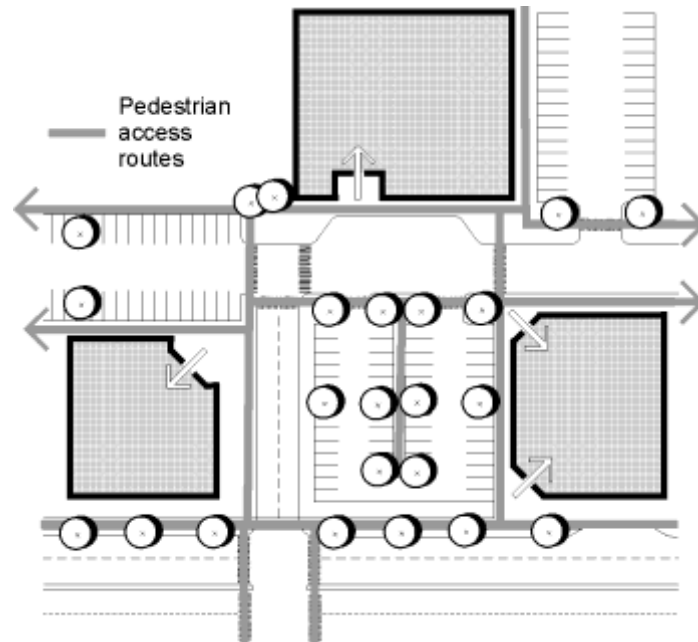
Good internal pedestrian circulation. Note connections from the street, between buildings and through parking lots.
